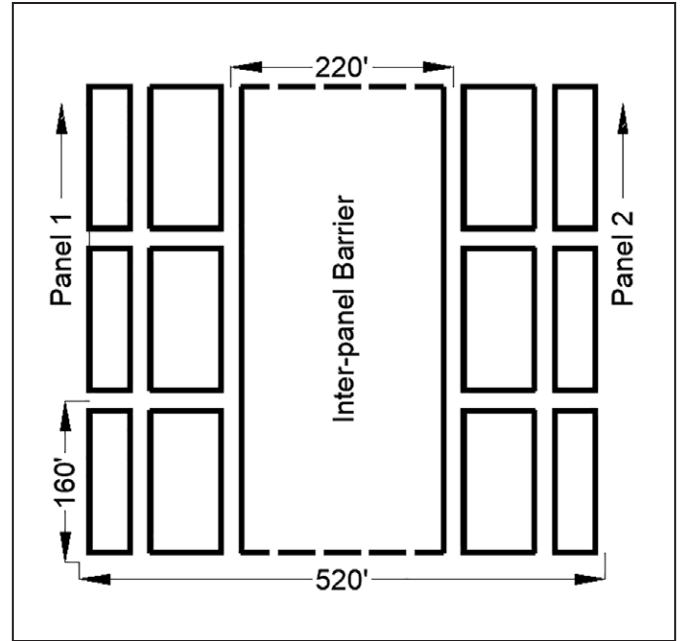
Plan view of mine map depicting the currently used three-entry yield-abutment pillar layout with an inter-panel barrier
